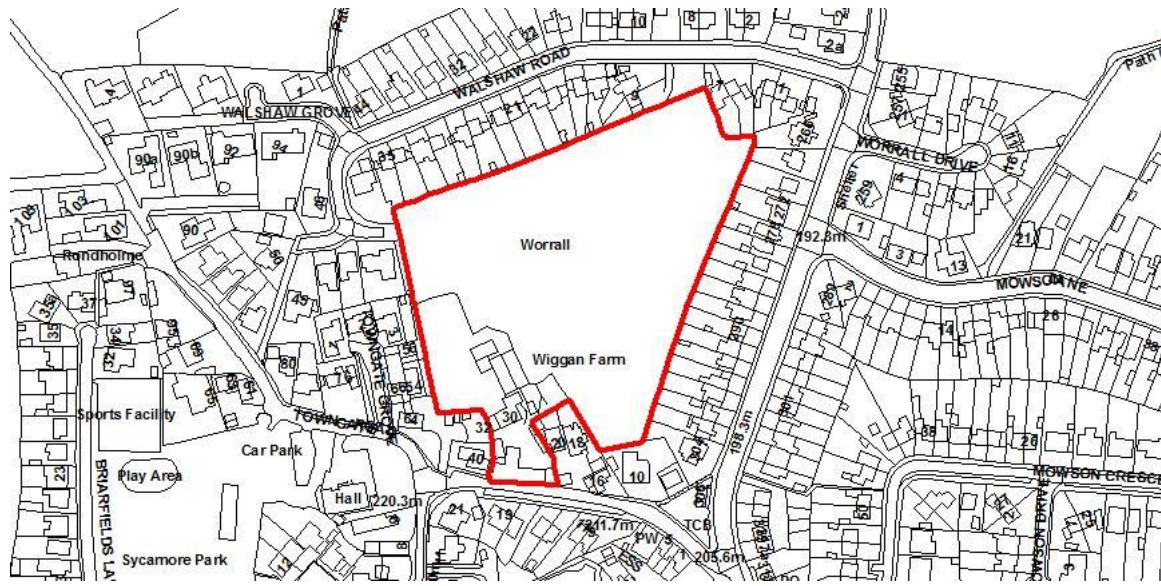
PS Site Location Plan (showing the amended redline boundary) published 2/9/2022
